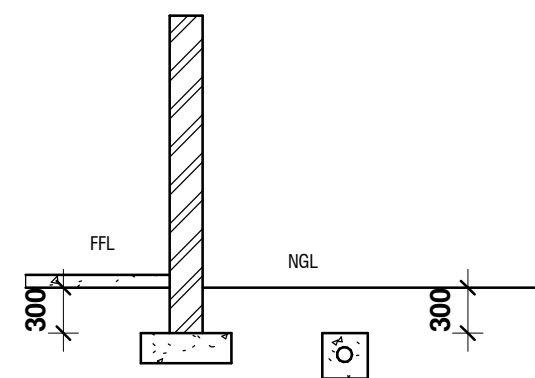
DETAIL OF HIDDEN DUCT ON GROUND FLOOR
